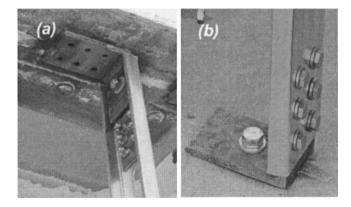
Wall W5 stud-to-floor anchorage using 12.7 mm thick steel angle: (a) top; (b) bottom
